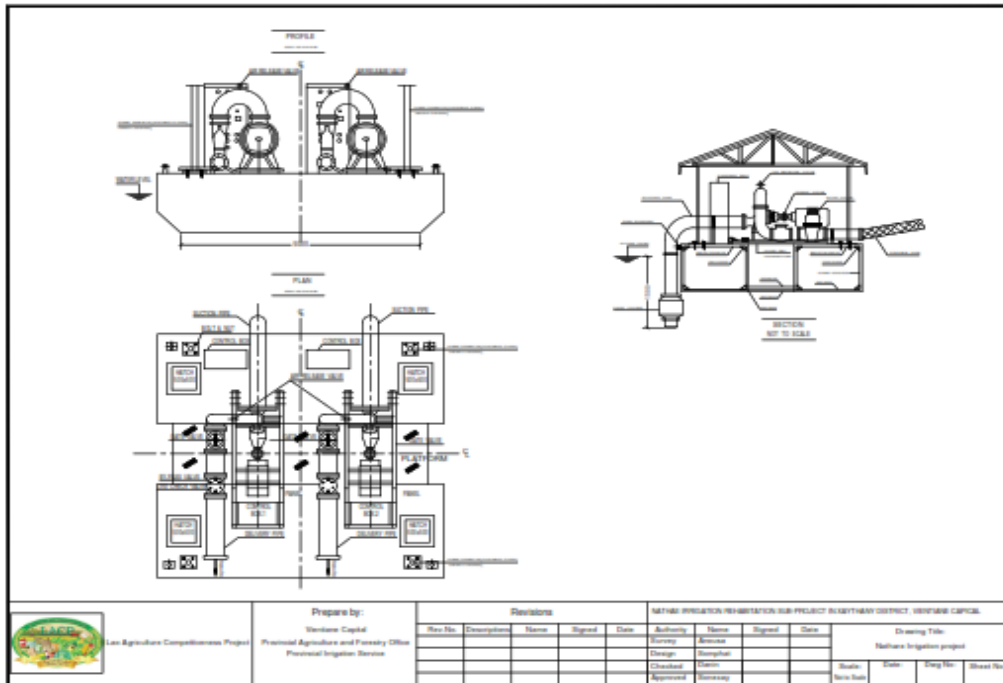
Proposed Pumping Unit Installation and pontoon view and cross-section
